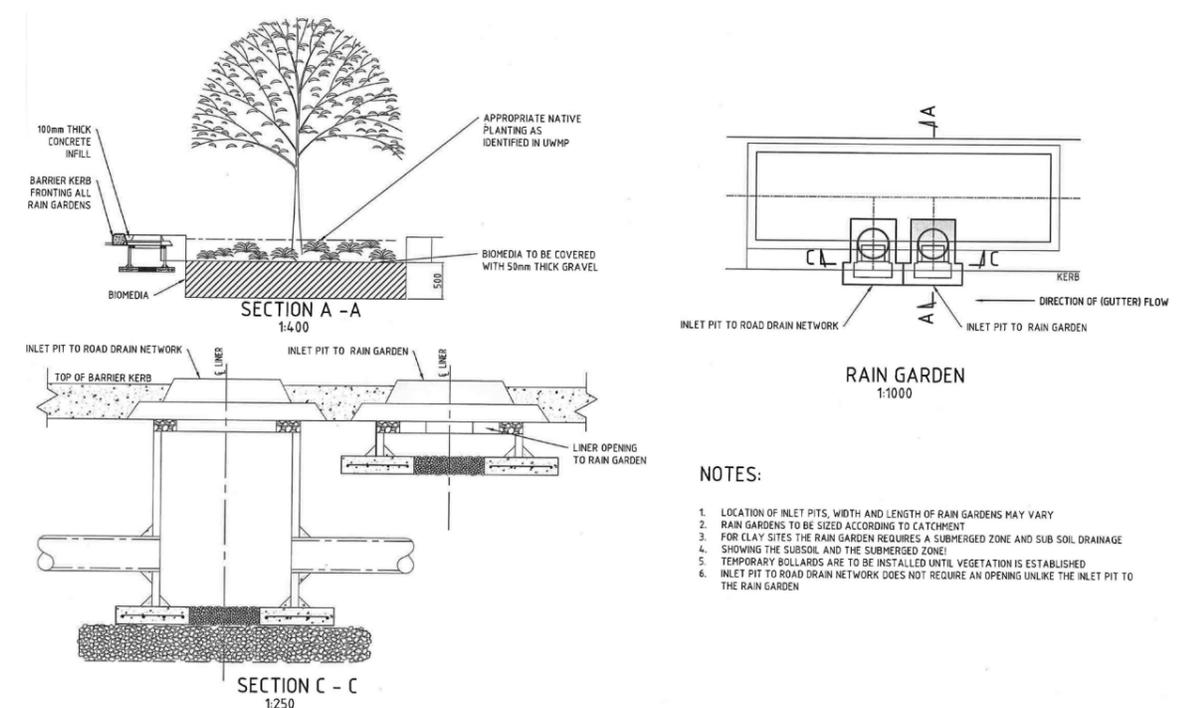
Typical Bioretention (Rain Garden) Arrangements
